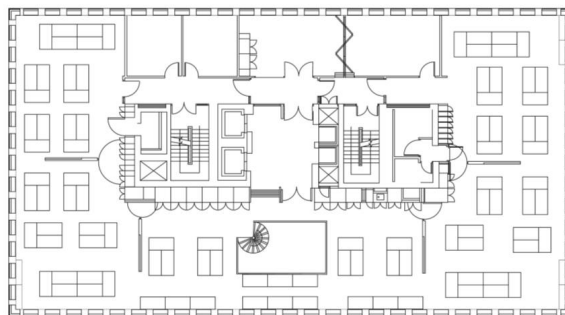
12 The Arts tower plan showing the curtain walls all over the facade. Source: Author
